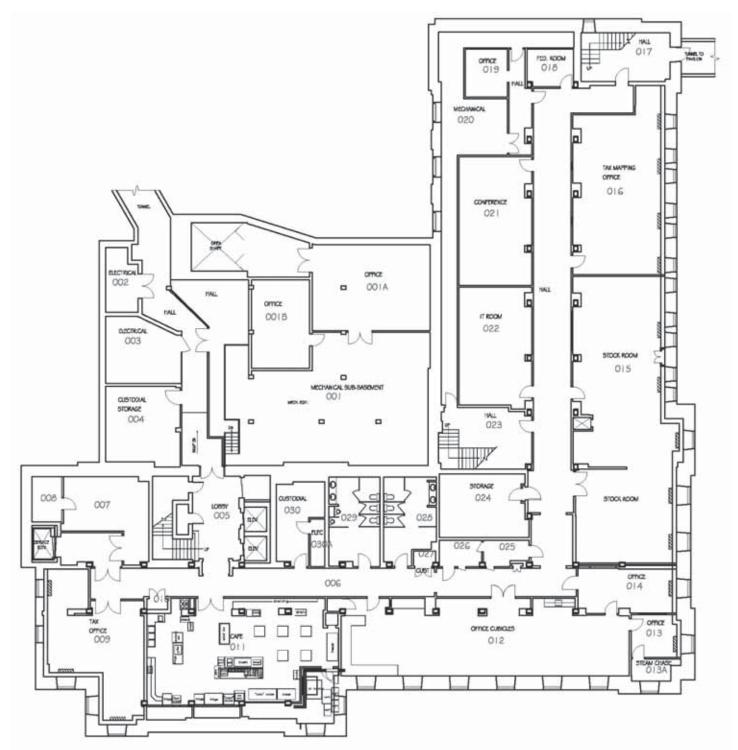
Basement Floor Plan (source: VT Buildings & General Services, N.T.S.)
